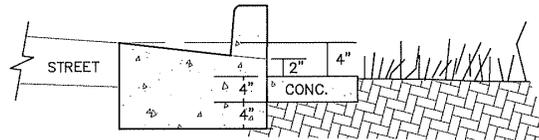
DETAIL A - WITH WINGWALLS AND CONCRETE PAD
